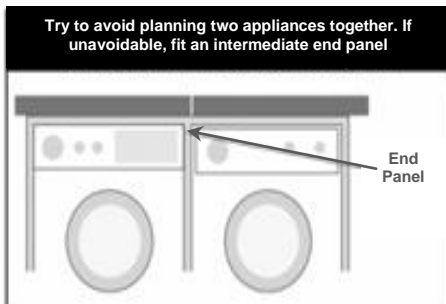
Apollo Slab Tech® Worktop Layout considerations
